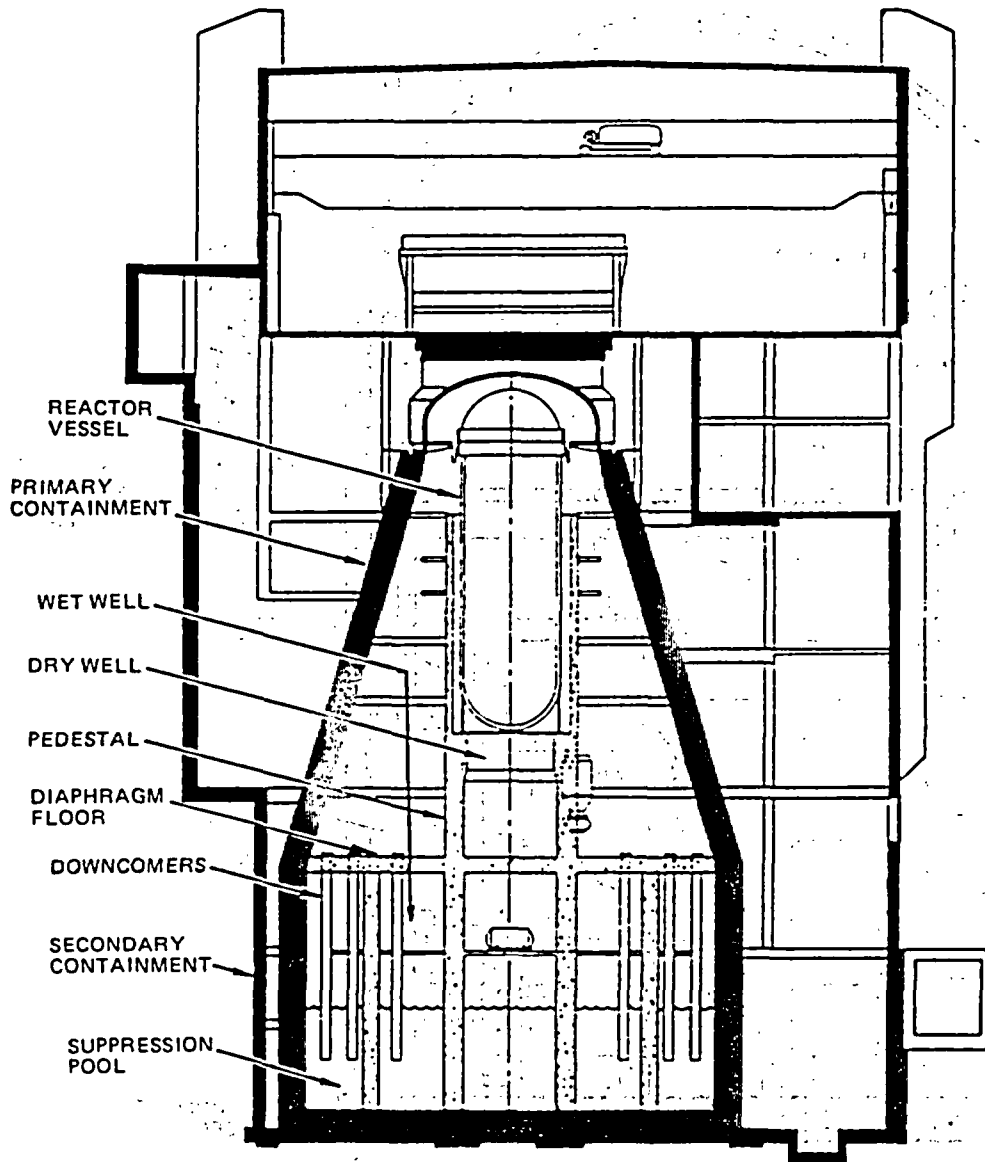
BWR Mark II containment configuration. Source: *Containment Performance Working Group Report, Draft Report for Comment*, NUREG-1037, U.S. Nuclear Regulatory Commission, Washington, D.C., May 1985.
